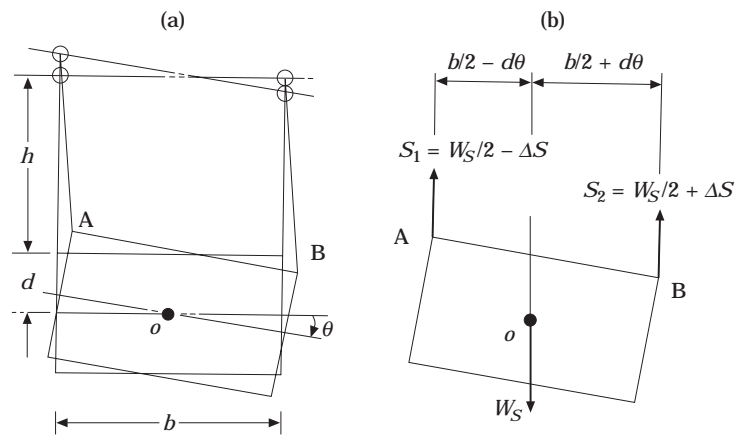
Torsional deformation of suspension bridge with deck of finite depth. (a) geometry; (b) cable tensions and dead load of stiffening girder.
